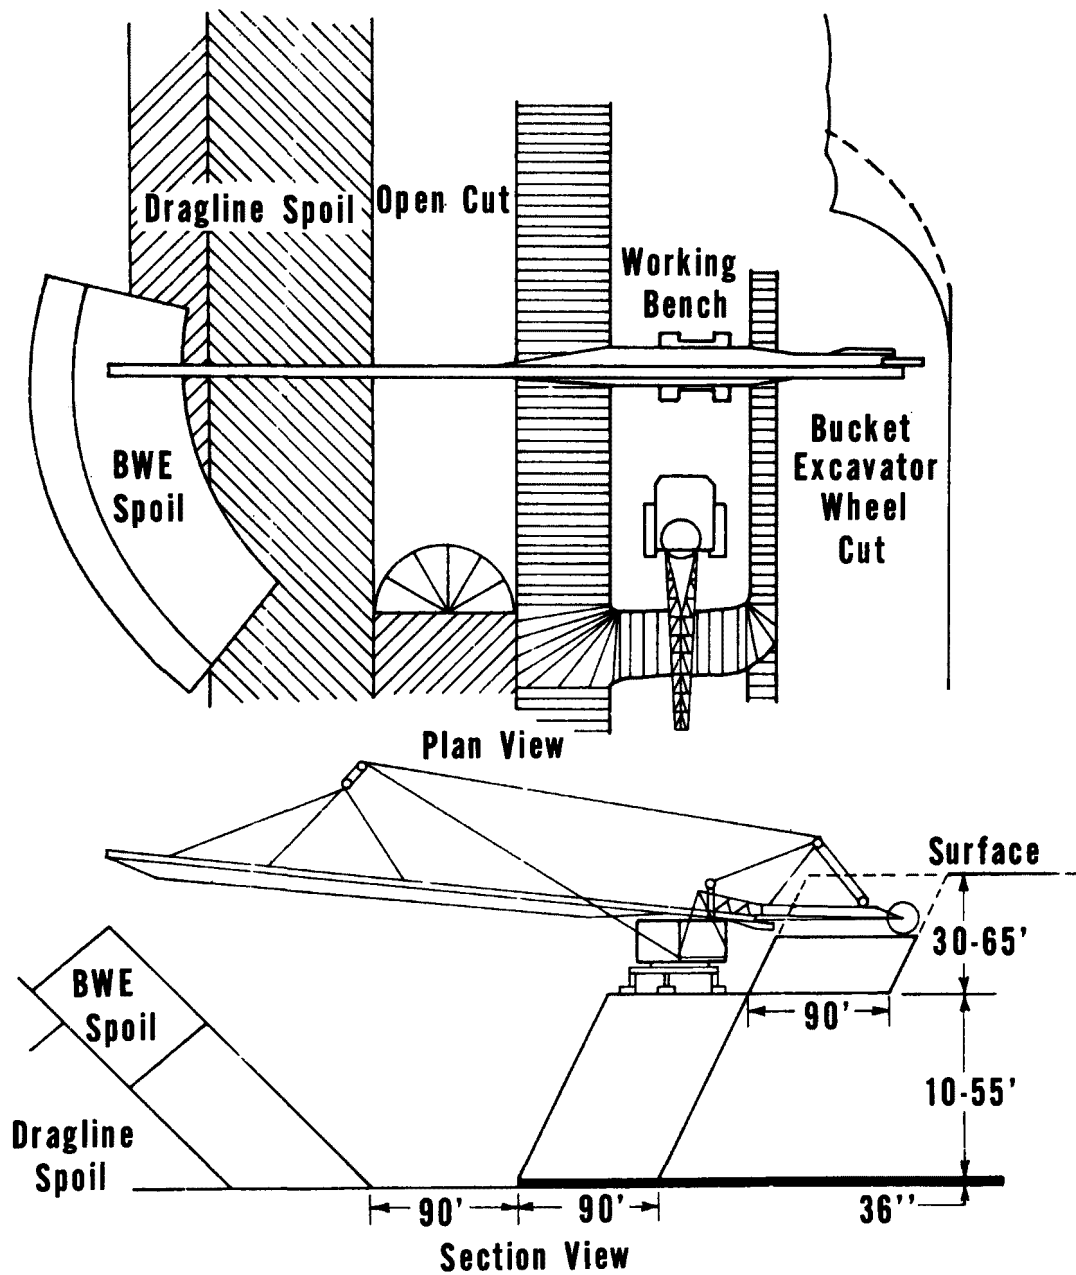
Plan and section views of a dragline and bucket wheel excavator in tandem operation.
